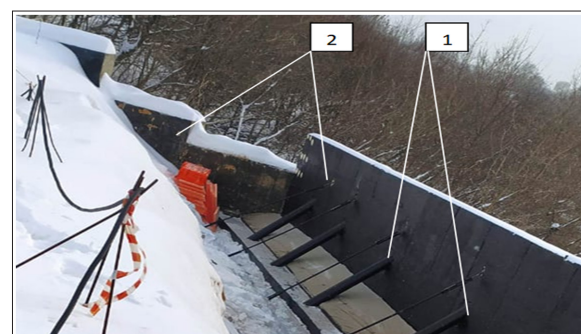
Photograph of the anchor fastening of the deformed slope on the landslide slope at an absolute elevation of 94.60 m: 1 - ERT ground anchor; 2 - monolithic reinforced concrete corner retaining walls
